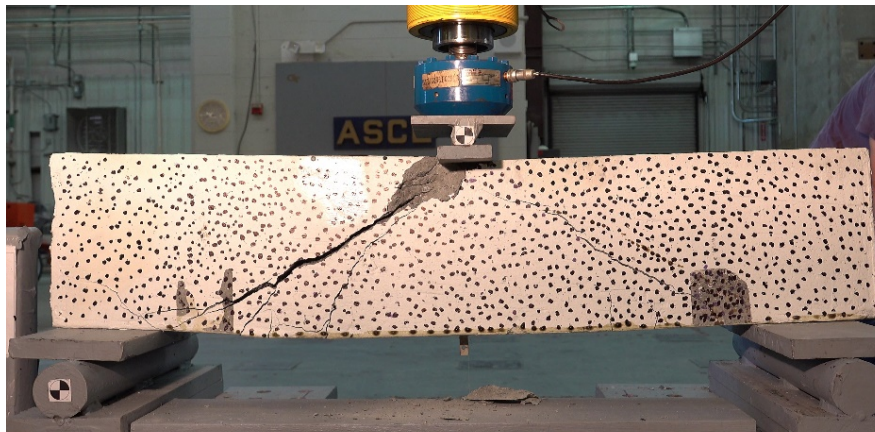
Behavior of epoxy-repaired reinforced concrete beam at failure.
